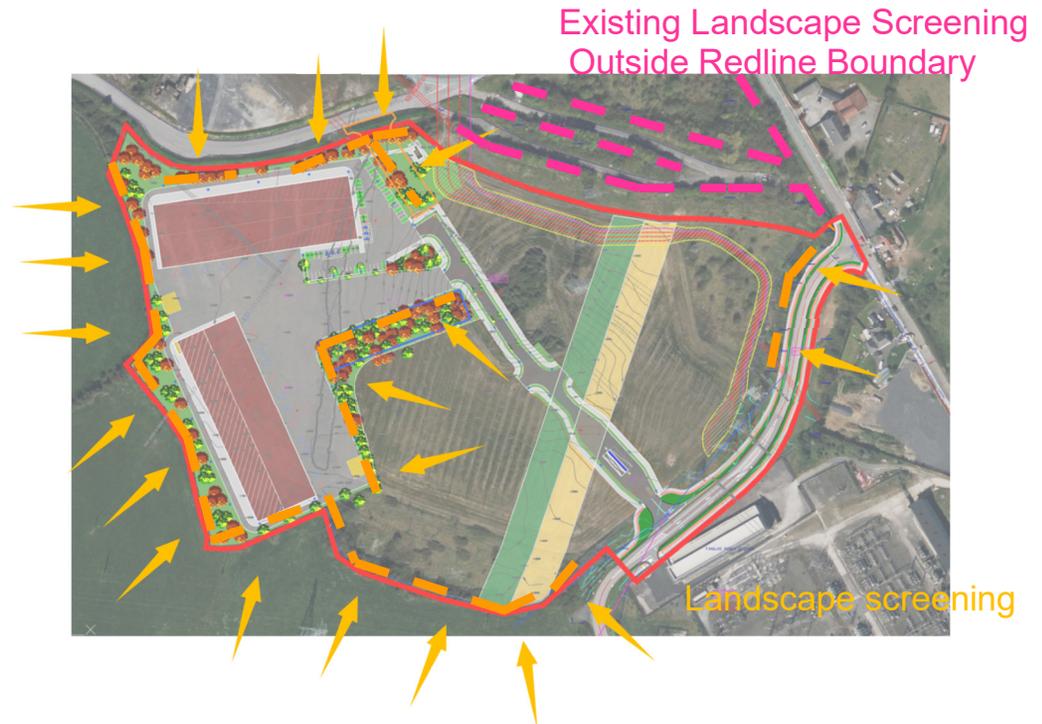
SITE PLAN WITH LANDSCAPE SCREENING TO SITE
